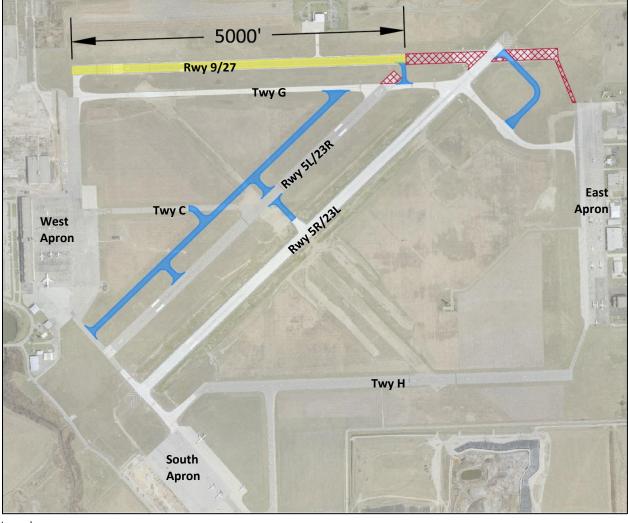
Alternative 10: Construct West Side Parallel Taxiway
